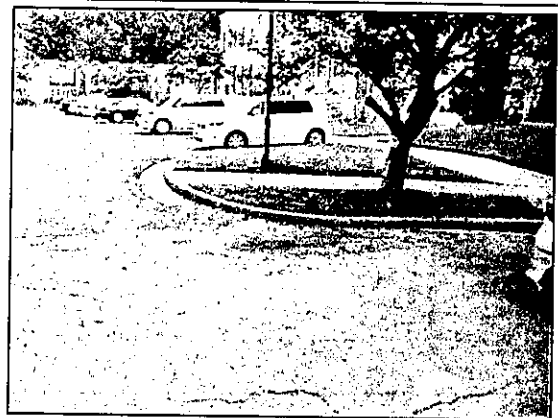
Depressed pavement indicating damage to the base materials and bearing soils, Breckenridge Court.
